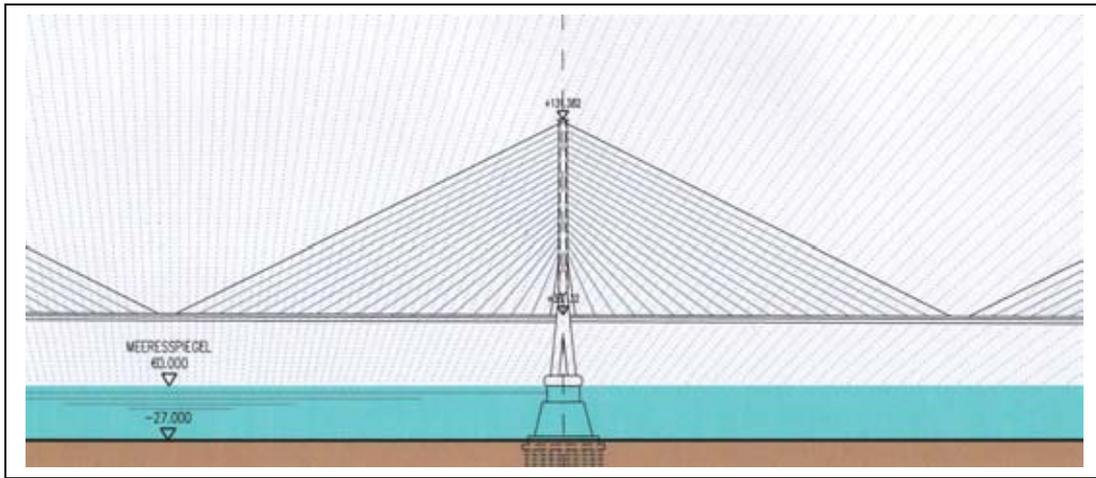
Typical cable stayed bridge span of 385.0 m.
